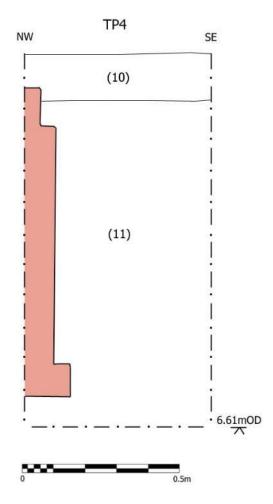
NE facing section of TP4, with party wall foundation shown in red. Original drawn at 1:10.
